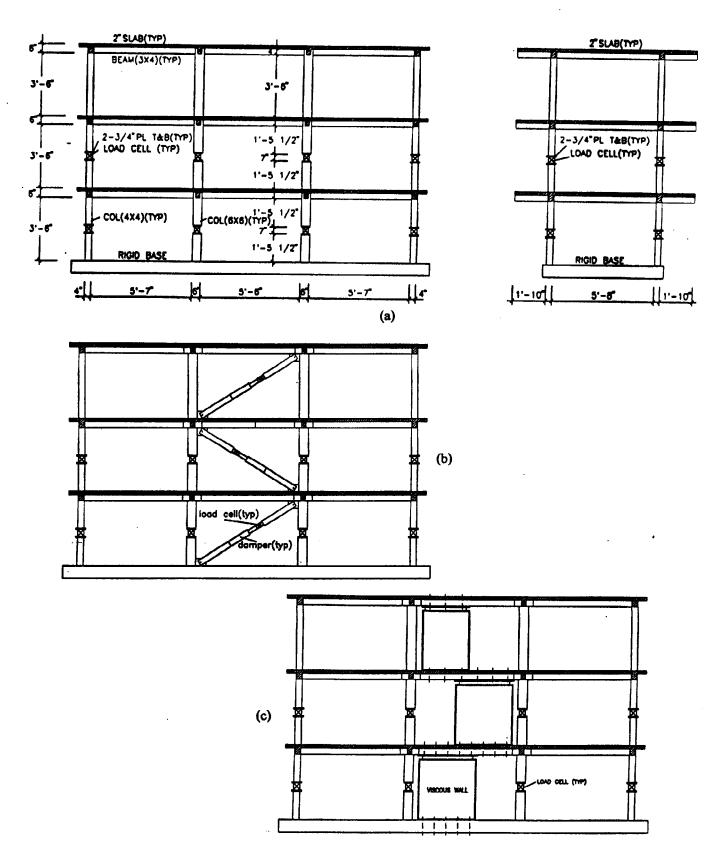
Test structure; (a) dimensions; (b) retrofit with braces; (c) retrofit with walls
